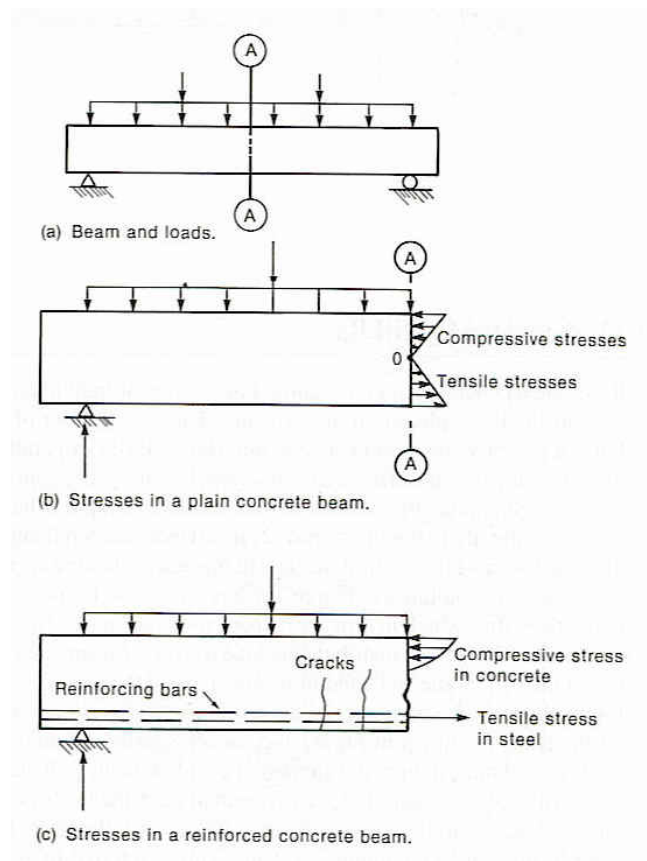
Theory of Reinforced Concrete in Flexure (Kramer 2005)
